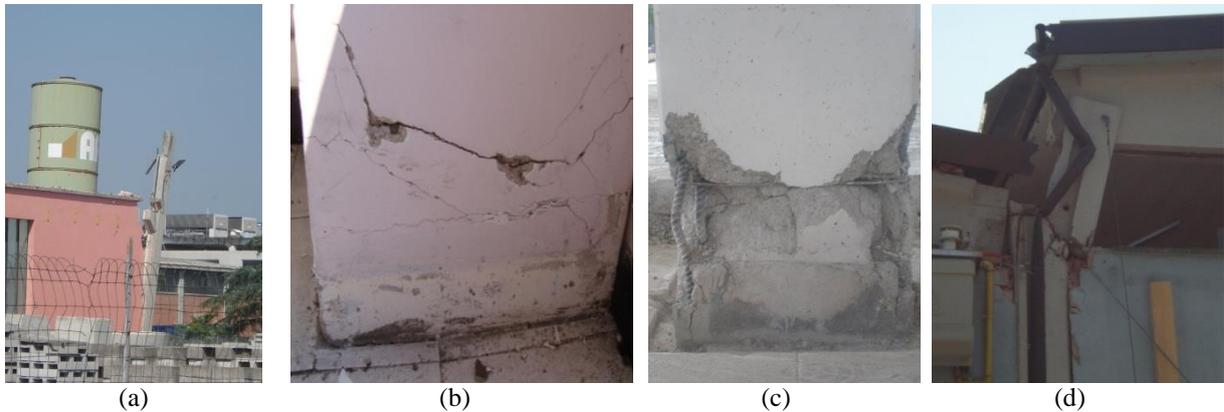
Damage in columns: (a) column loss of verticality due to rotation in the foundation element; (b) cracking of the base section in a column; (c) plastic hinge at the bottom of the column and buckling of a longitudinal bar at the base; (d) shear collapse of column due to the interaction with infill masonry panel
